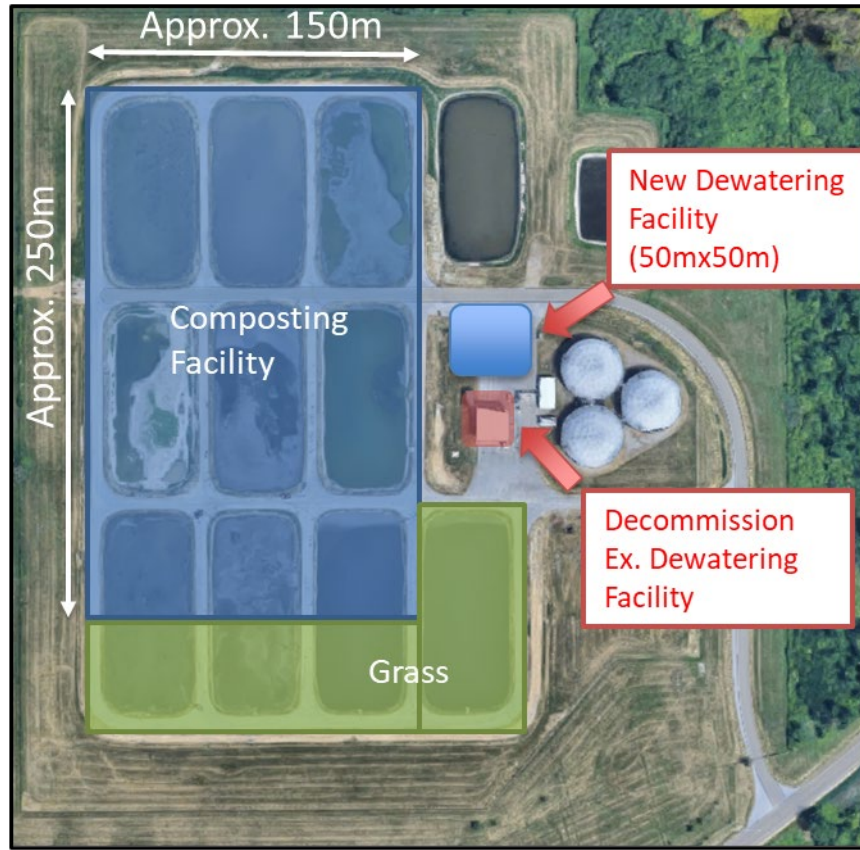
Strategy 5 – Garner Road Facility – Conceptual Site Plan
